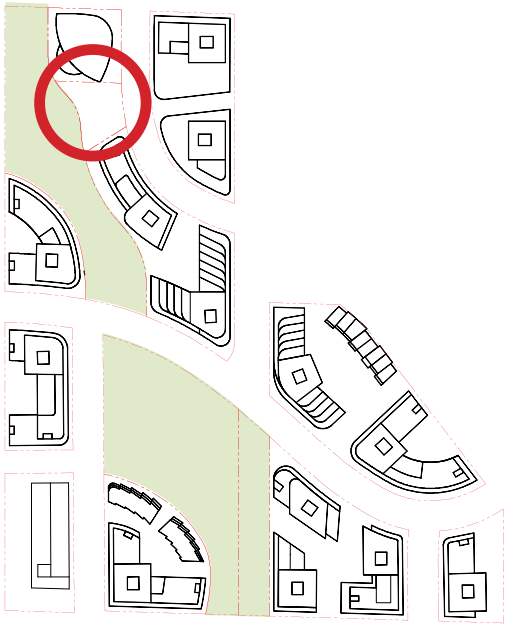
Key Plan – MST Cultural Centre Plaza
